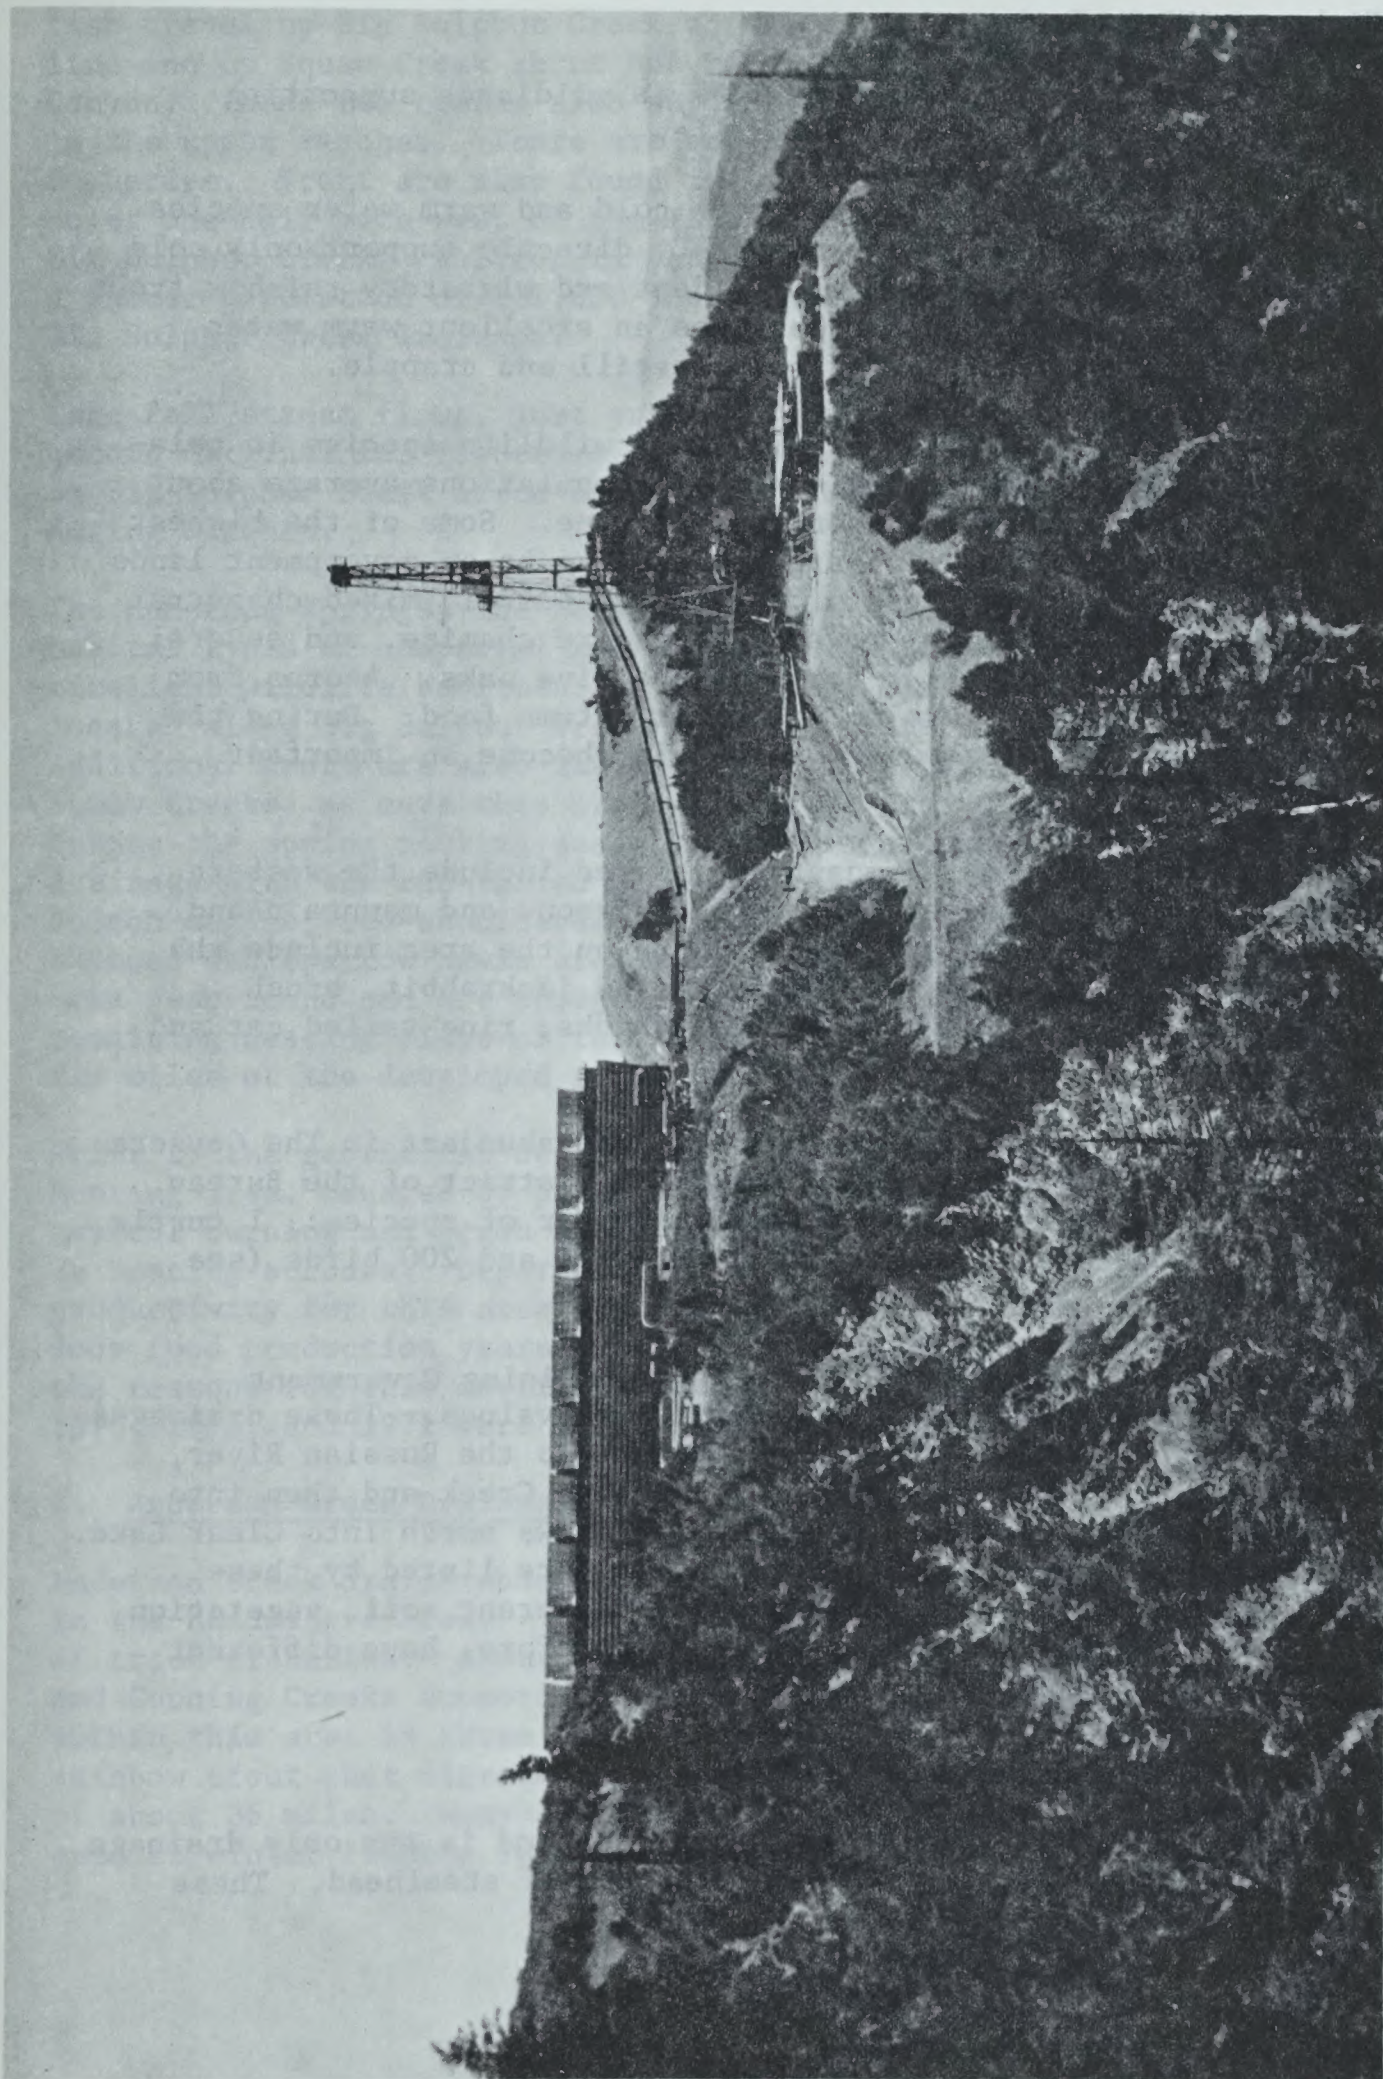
Geothermal development: a power generating plant and a steam well drilling rig on private land at The Geysers
